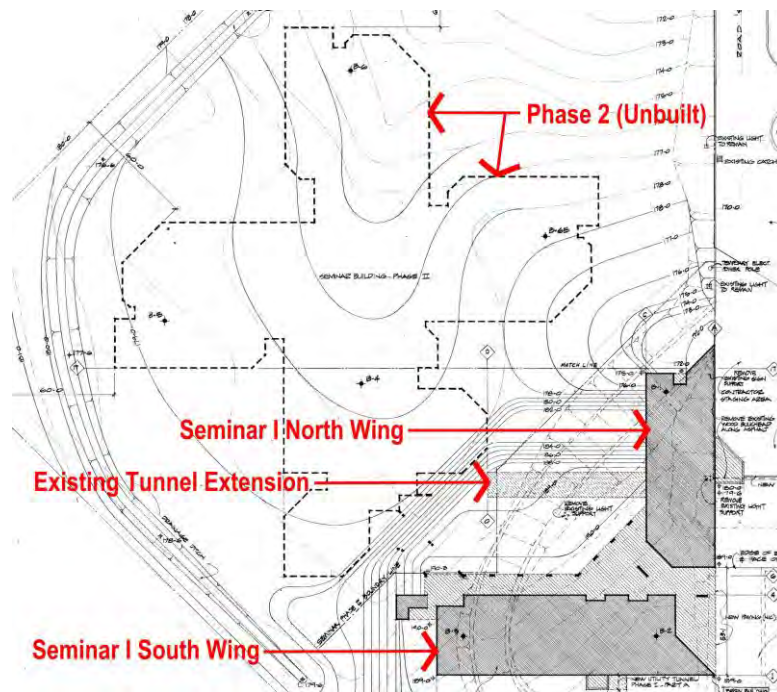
Original site plan, showing existing and intended development. (Note: Above the ground floor the south and north wings are linked as depicted by the lighter hatch pattern.)
